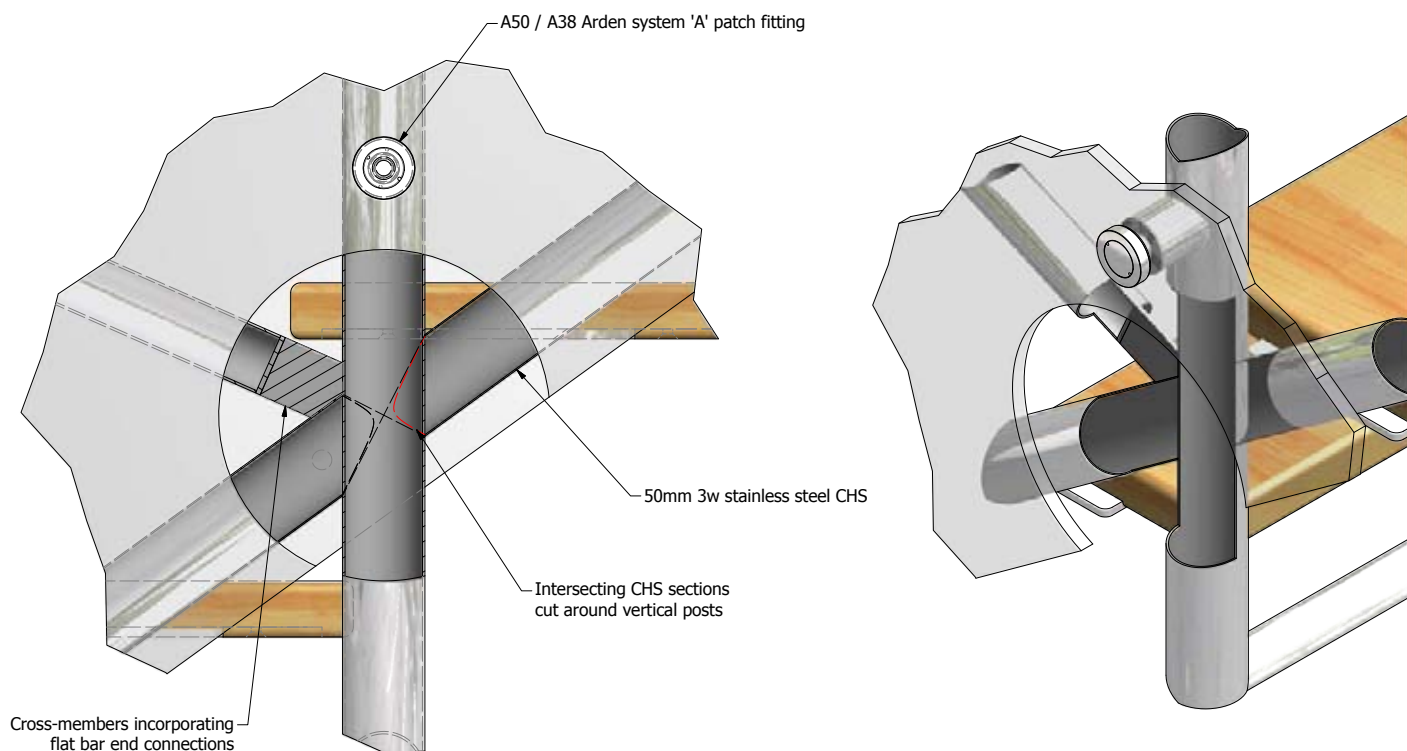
Truss member intersection / interface detail. At the intersection, either the vertical members can continue (as illustrated in this diagram) or the raking members can carry through (as photographed).
